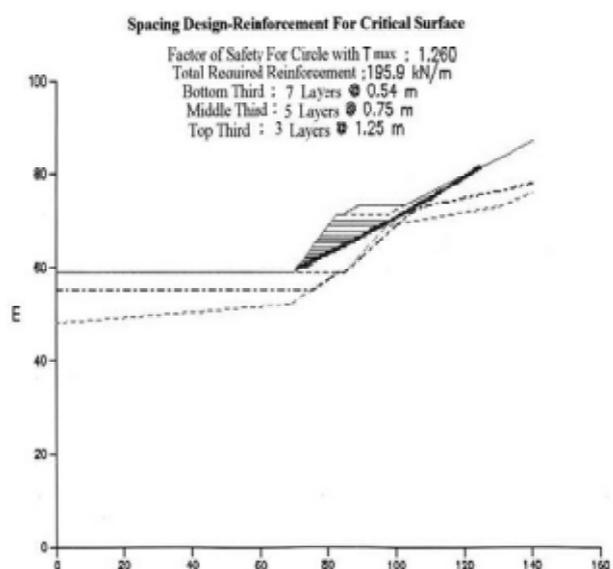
Reinforced Soil Slopes (RSS) design for 1.5: 1 slope
